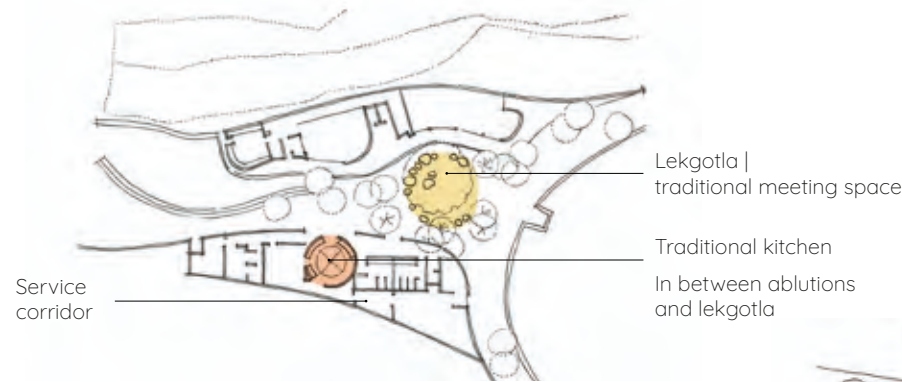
Diagram depicting plan of traditional kitchen (Archdaily 2020, Van Staden 2021).
